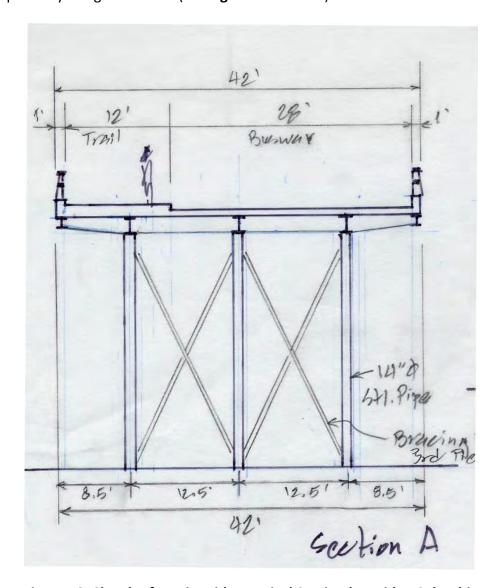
Sketch of Iconic Bridge Typical Section by Bridge Columbia
